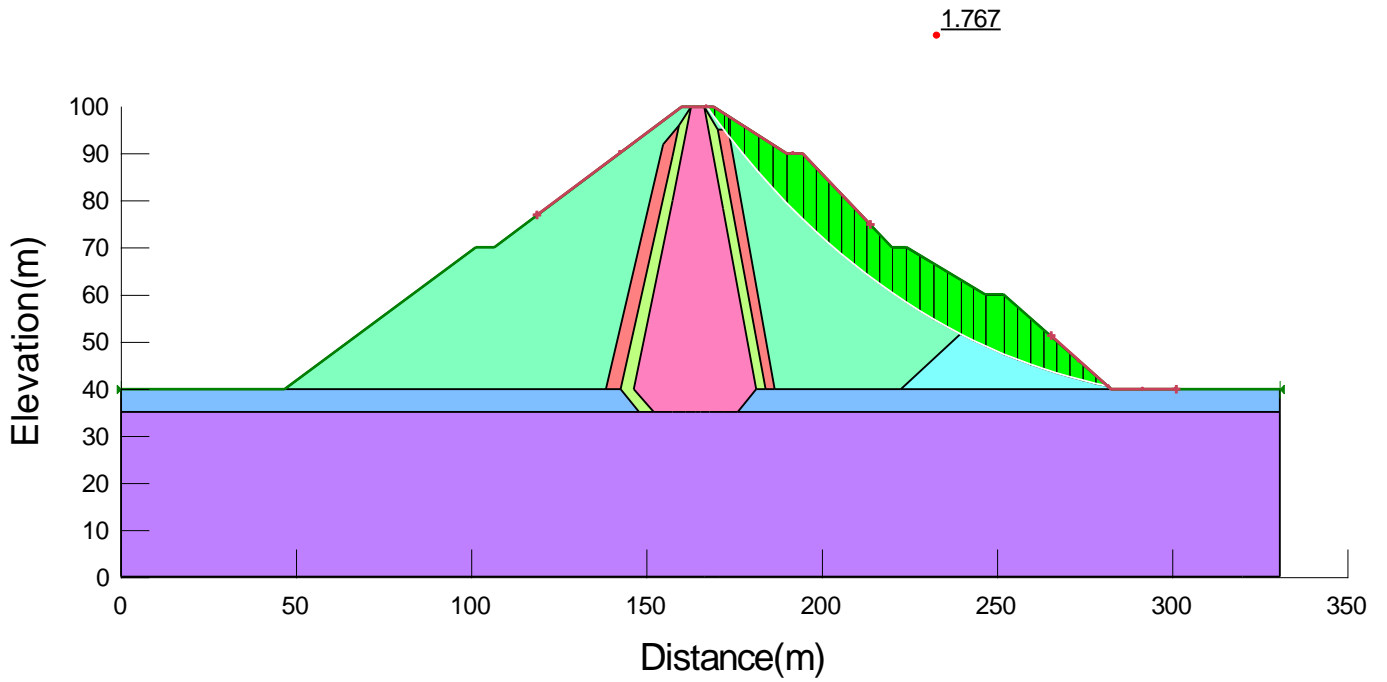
Slope Stability at end of construction without Earthquake CC (D/S)
